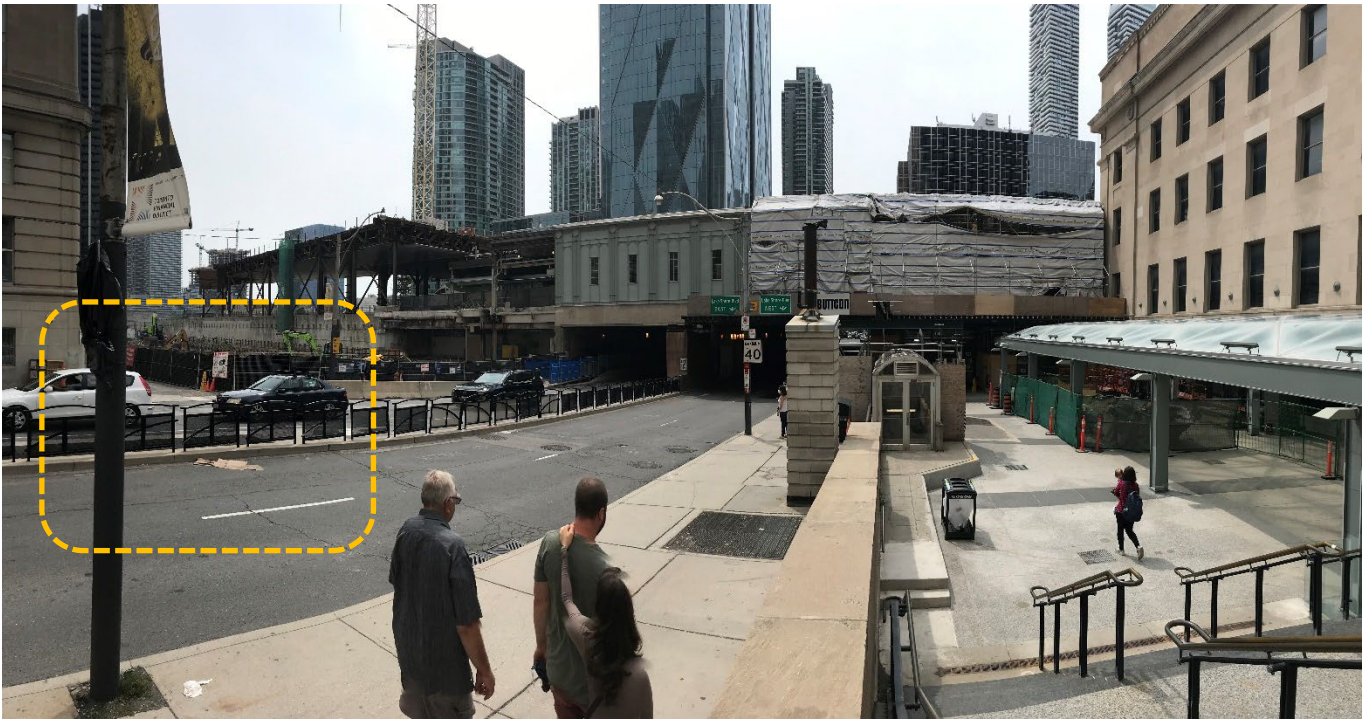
Approximate location of proposed intervention adjacent to the southwest corner of the Dominion Public Building. Note the ongoing construction at 141 Bay Street between the Dominion Public Building (left) and the Union Station Trainshed (centre)
